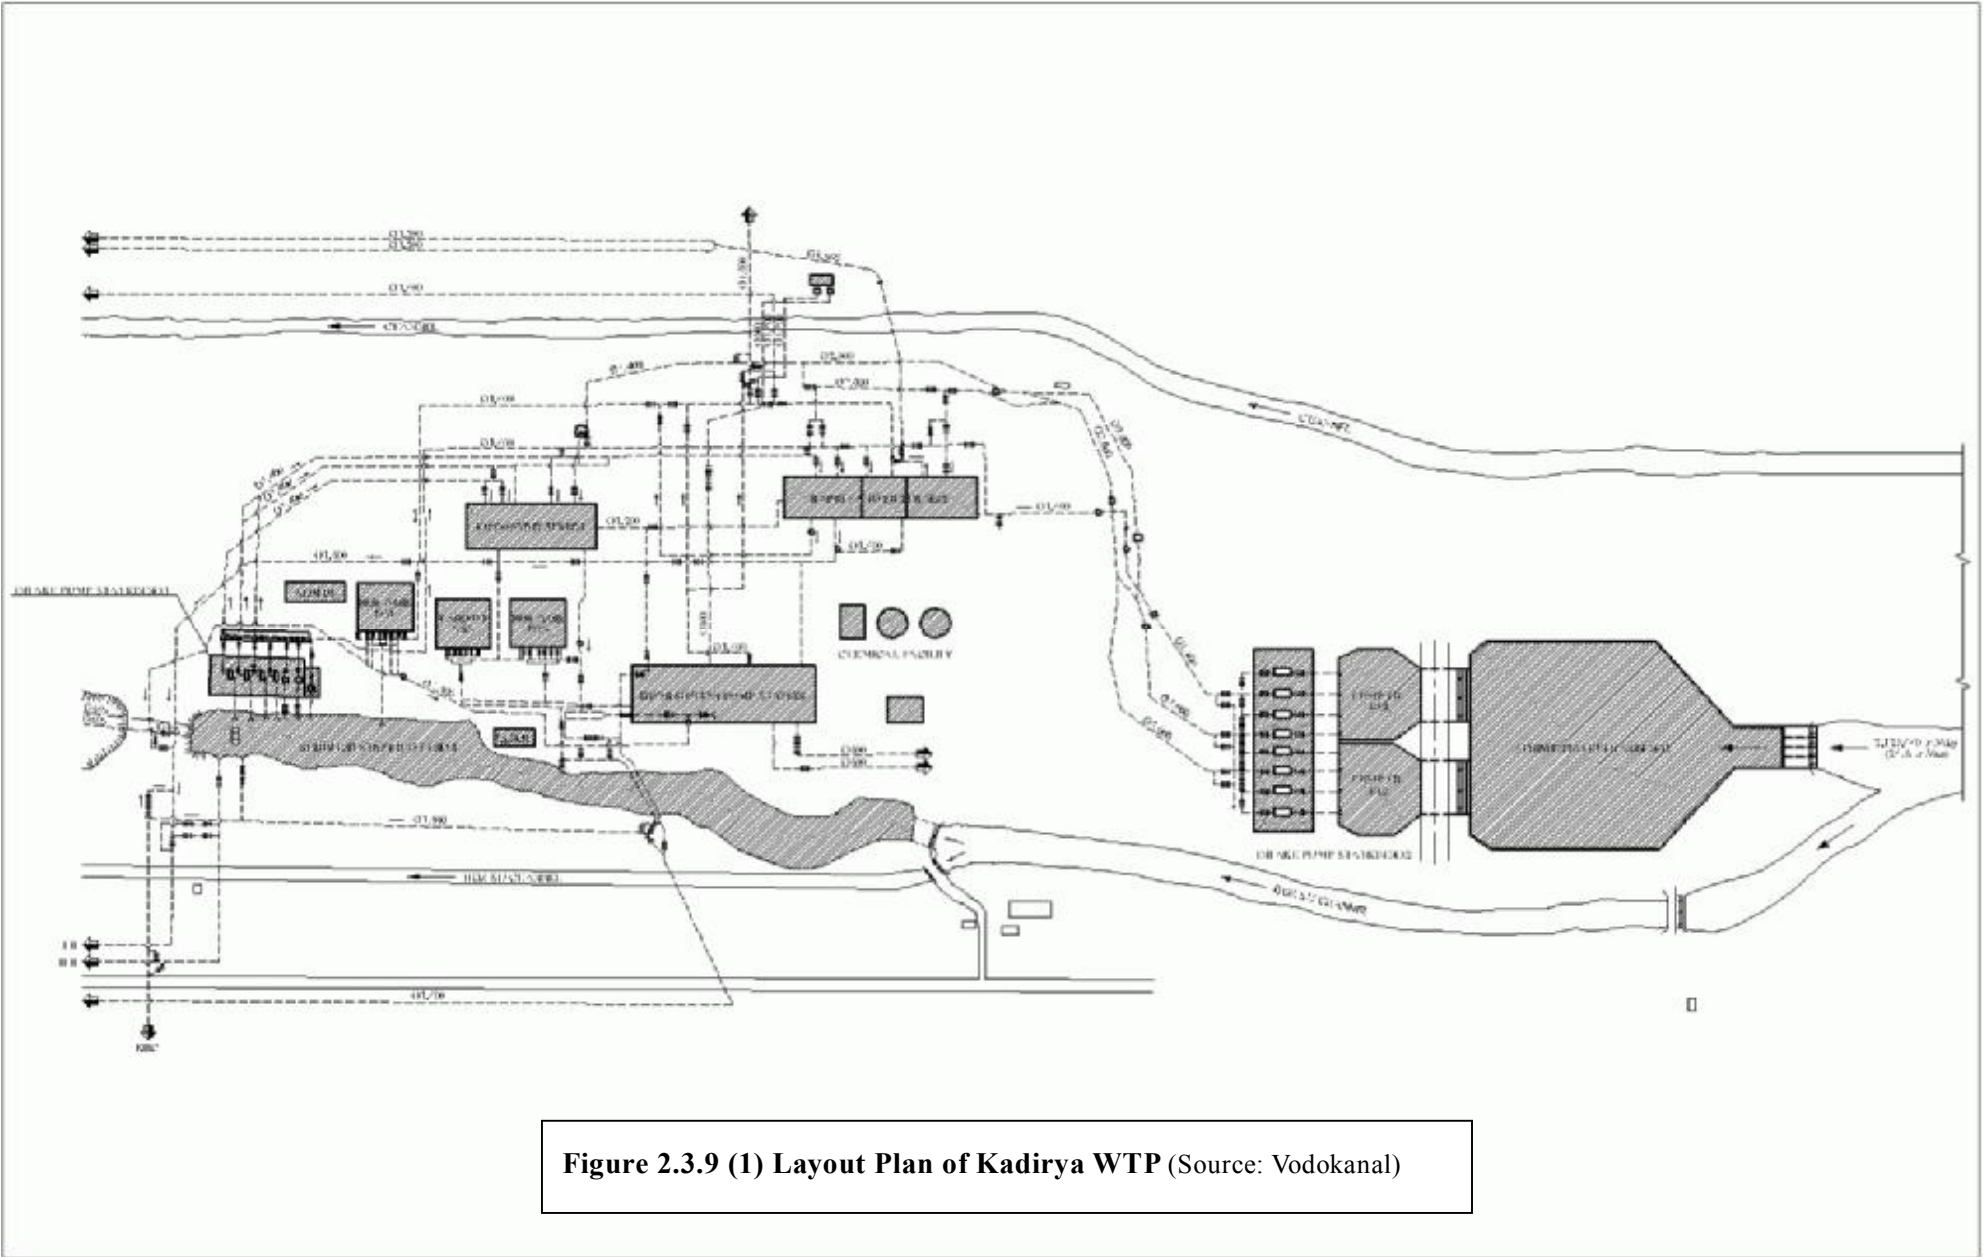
(1) Layout Plan of Kadirya WTP (Source: Vodokanal)
